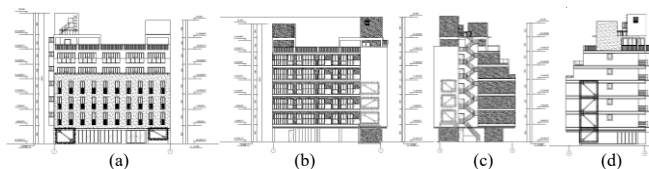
Elevation view of Building A11 from (a) front, (b) back, (c and d) sides.
